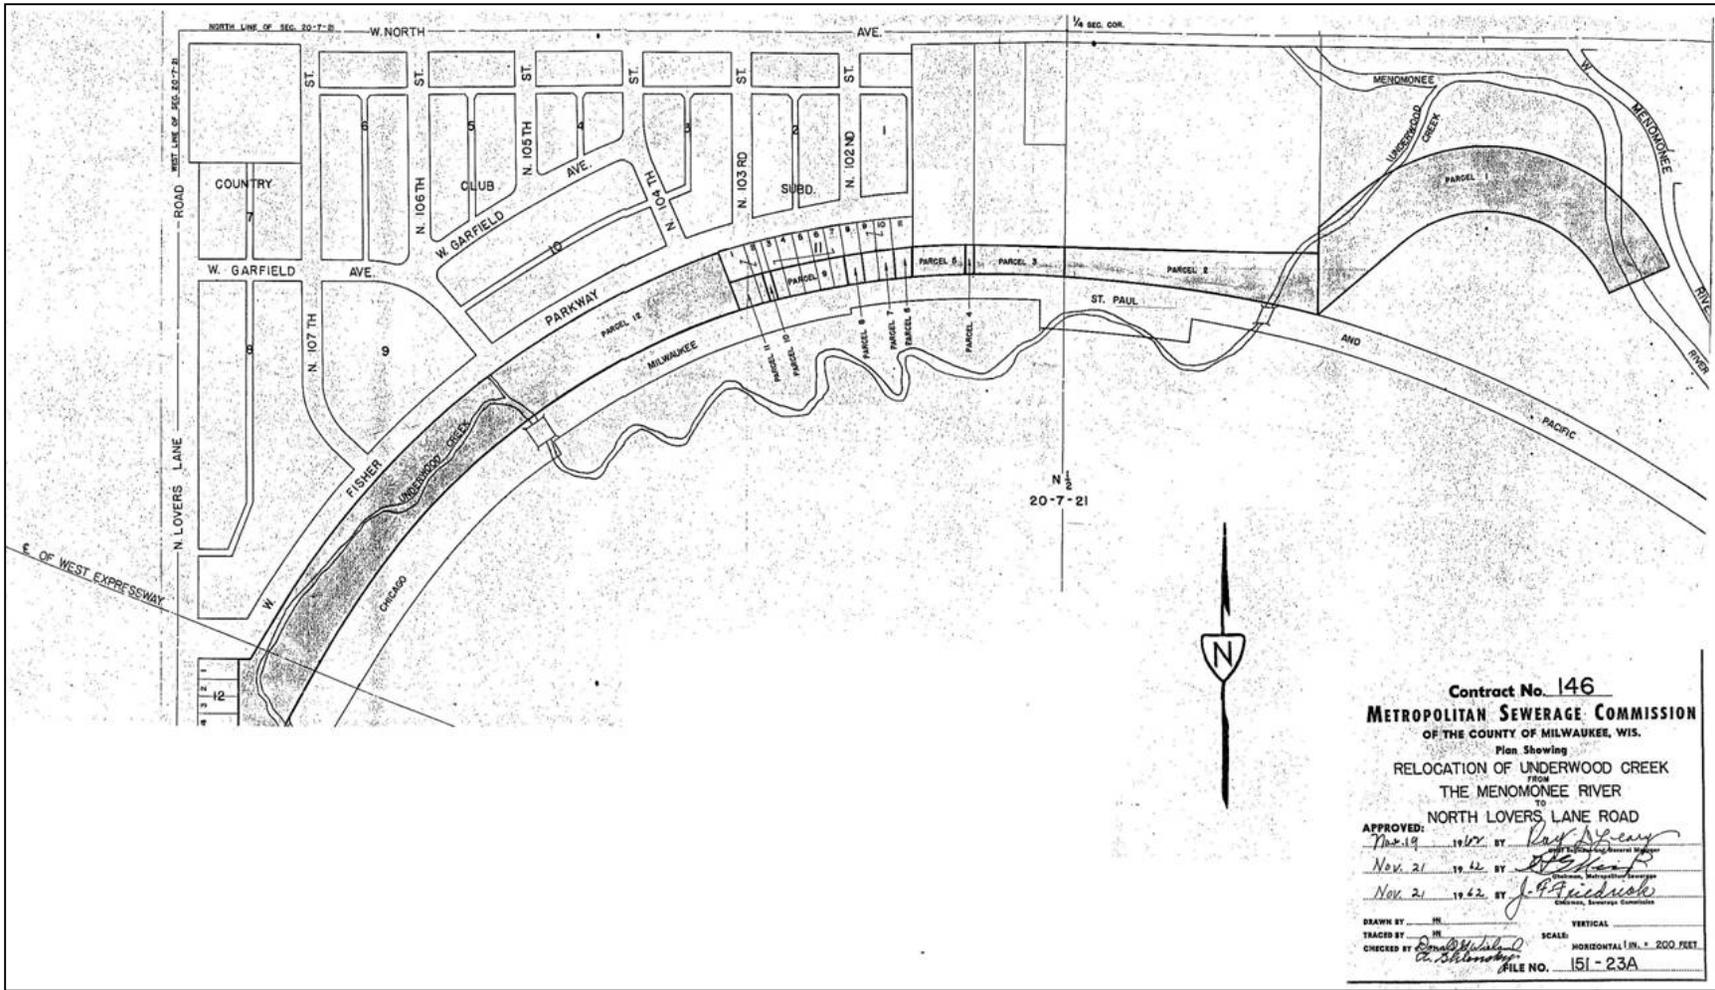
Underwood Creek Before Concrete Channel Realignment
